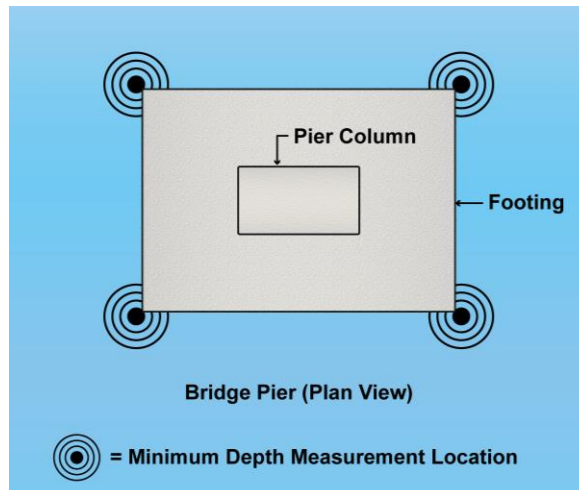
Illustration. Plan view of pier footing illustrating locations of scour depth measurements.
